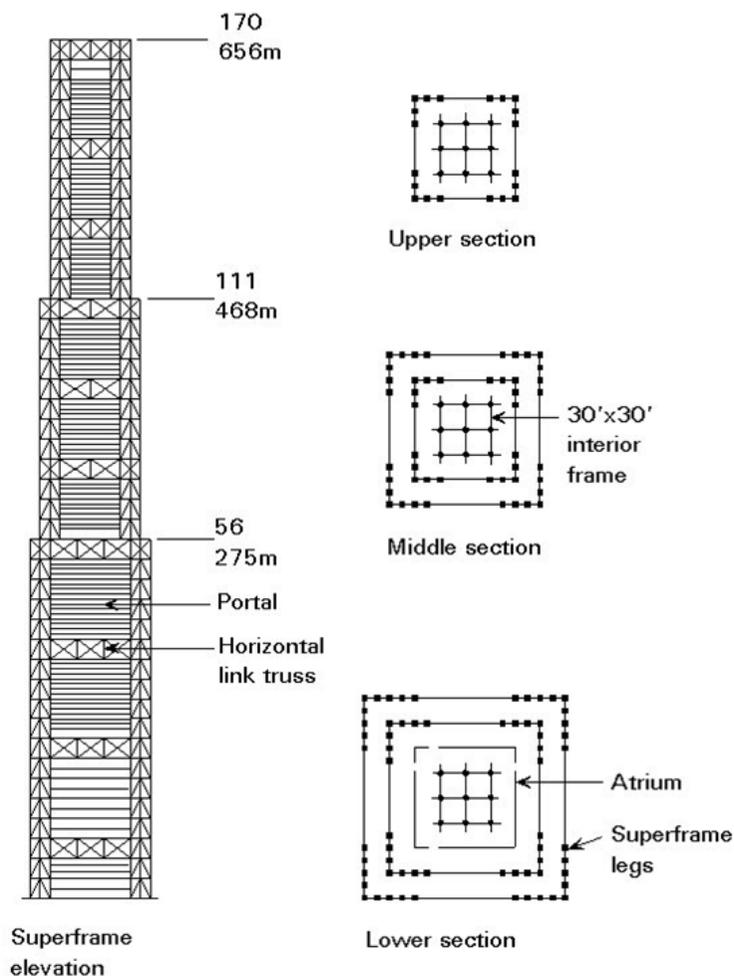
Chicago Ultra – High Building, Proposal for Steel Super Framed Structure, Elevation (left) and Characteristic Floor Plans (right) [71]
